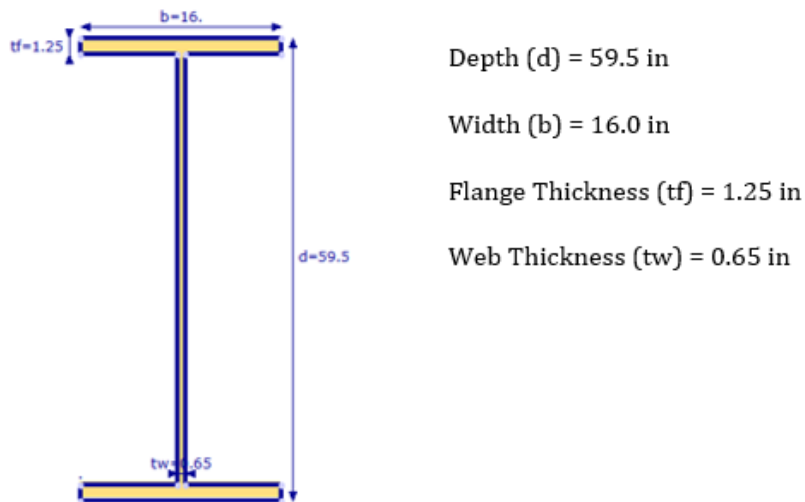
Straight Exterior Girder: Cross-sectional dimensions.
